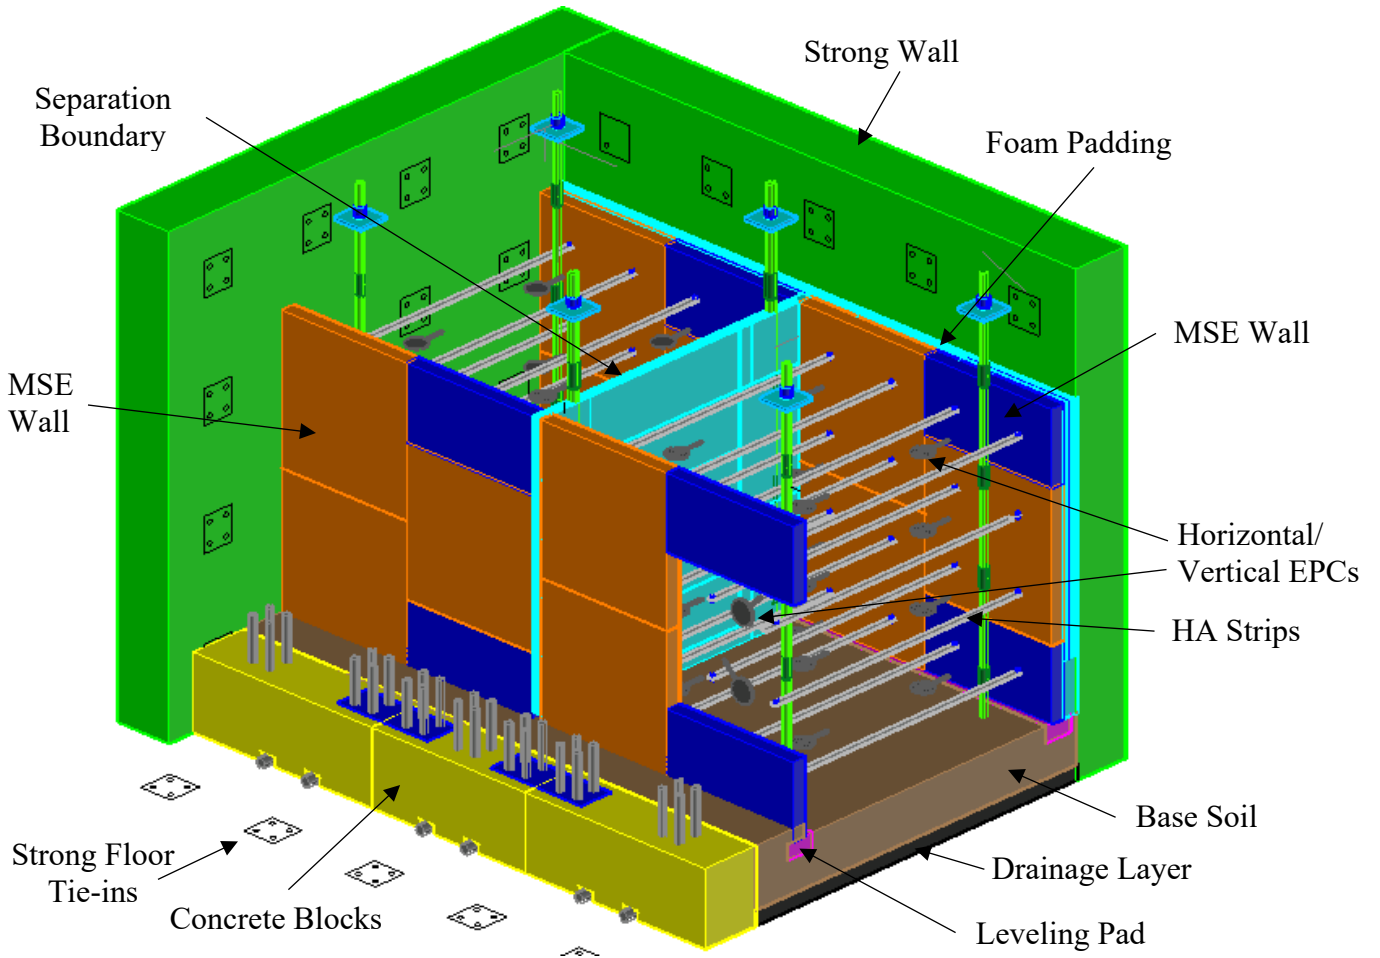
MSE wall configuration (Note: Right side Strong Wall and reinforced fill are not depicted for visualization of the reinforcements and instrumentation).
